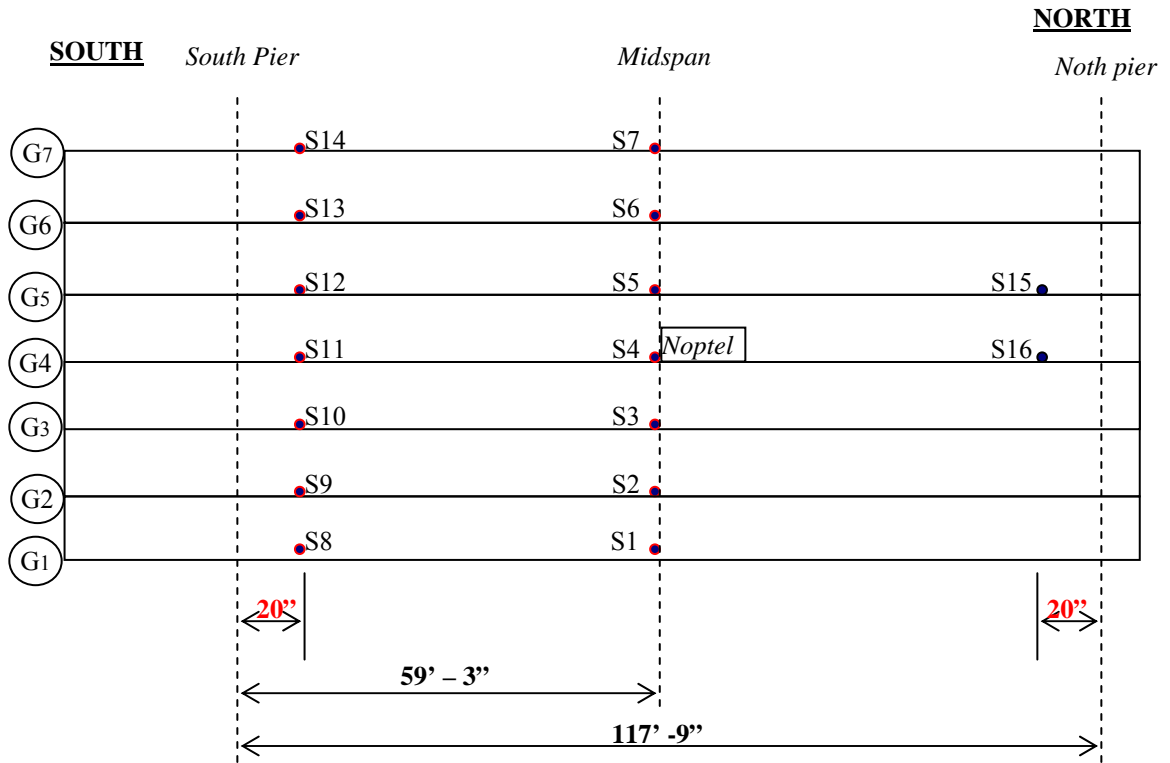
Strain Gage Location in Center Span of Bridge (S05-44044)
